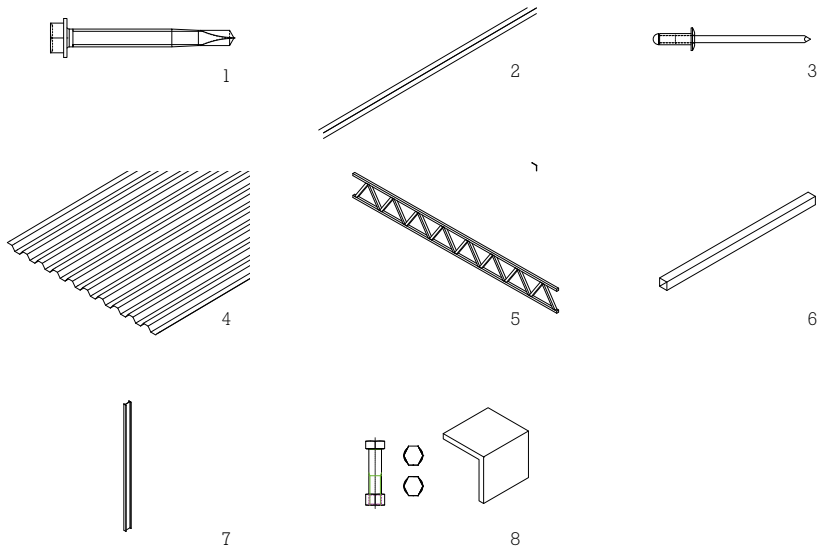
Construction detail - Joints and components of the structure | Elevations and axonometric views.
